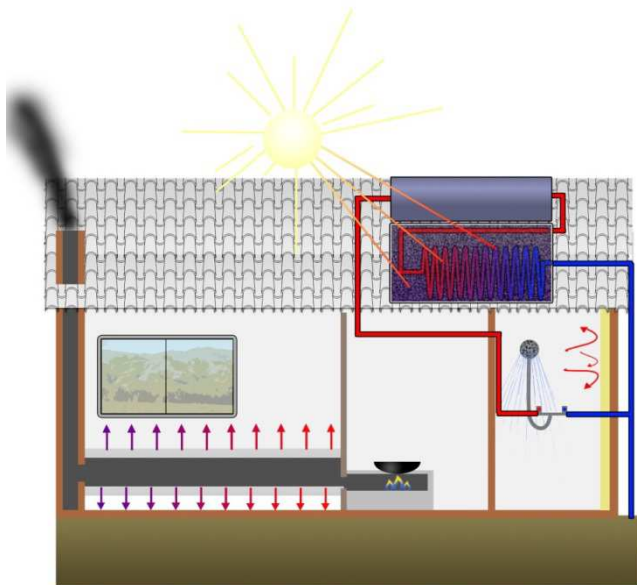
Traditional home with elevated Kang, improved windows, building insulation and domestic hot water system
